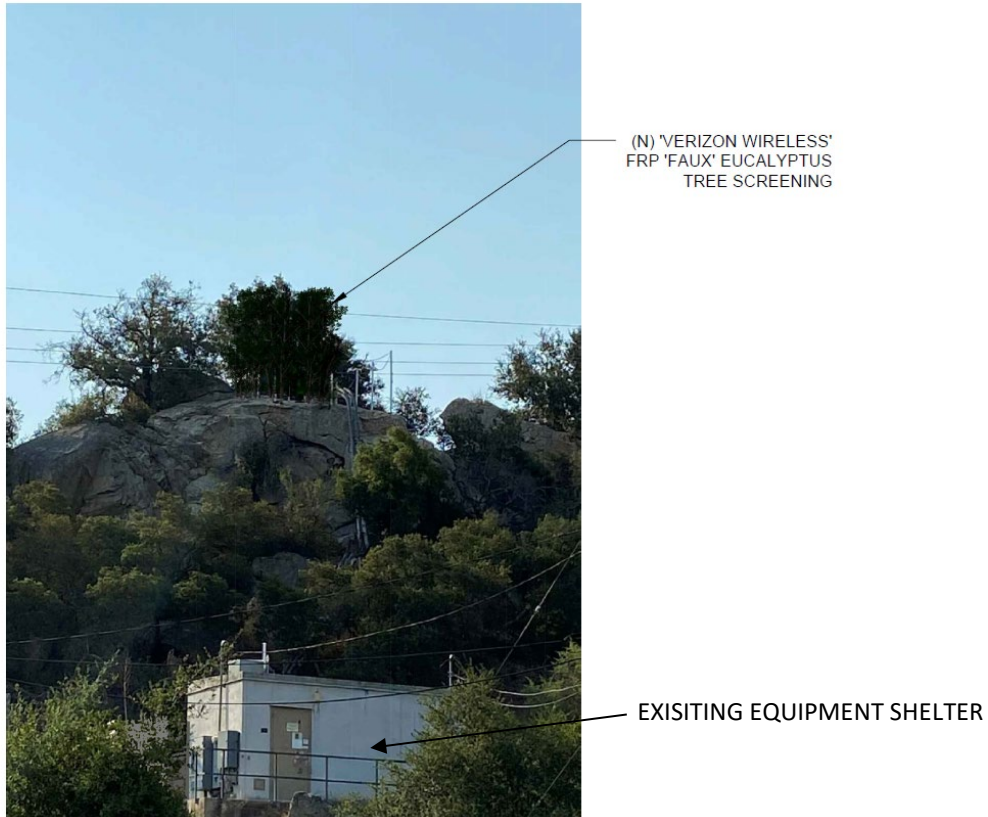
Existing Northwest view of 12-foot-tall wireless facility with proposed Faux Eucalyptus tree screening added to facility.
